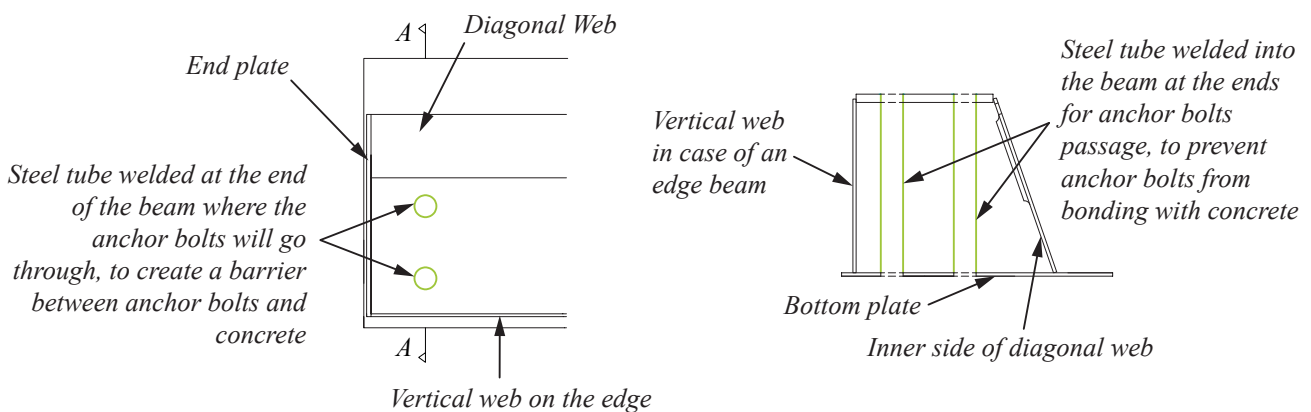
Steel tube in beam detail (plan, left). Steel tube in beam detail, (section, right).
